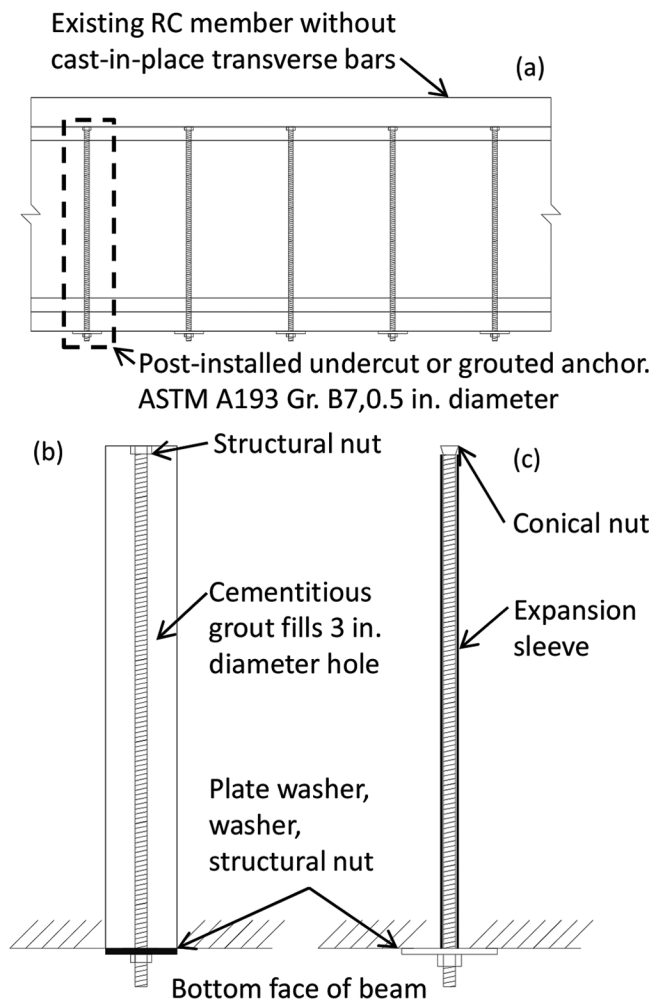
Retrofit techniques under investigation: (a) schematic layout of post-installed reinforcement in a specimen without transverse reinforcement; (b) grouted anchor components; and (c) undercut anchor components.
